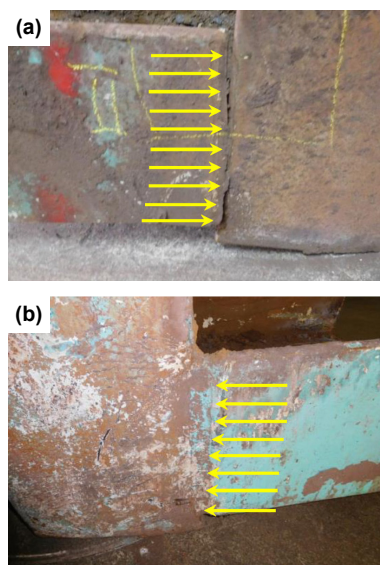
Welding defects of the column C1: (a) incomplete root penetration and cracks (Detail C in Fig. 6(b)); (b) undercuts.
